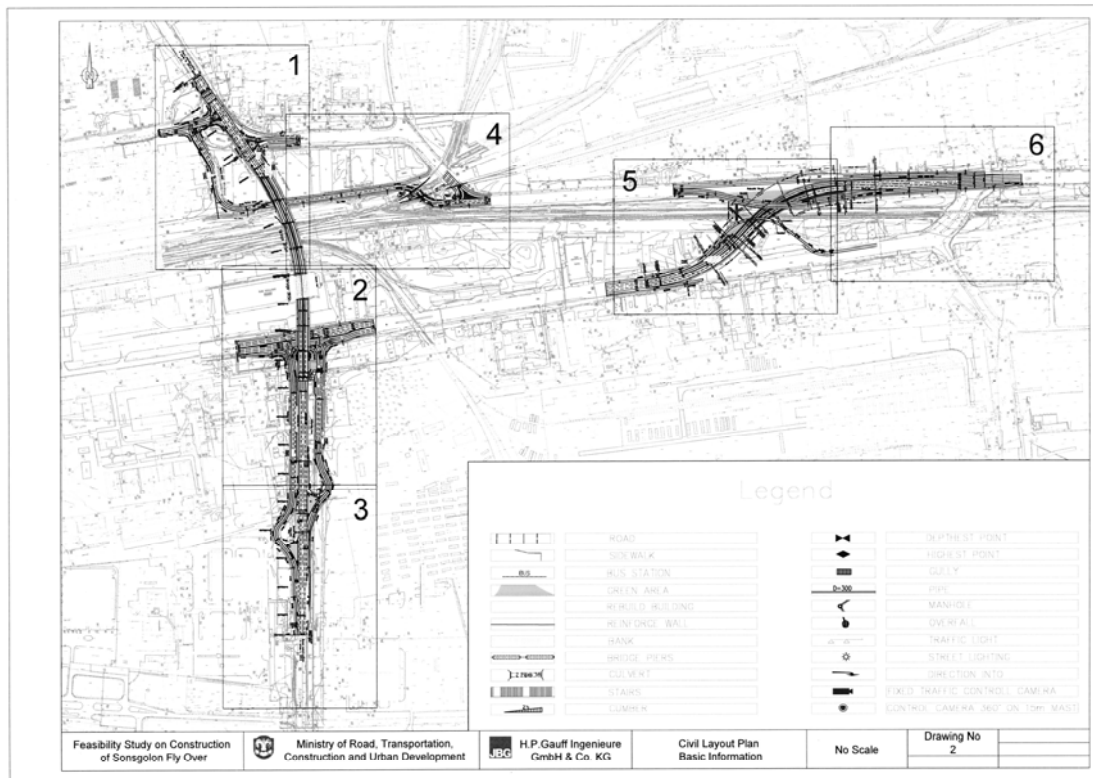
Flyover Project at West Intersection (Plan)
